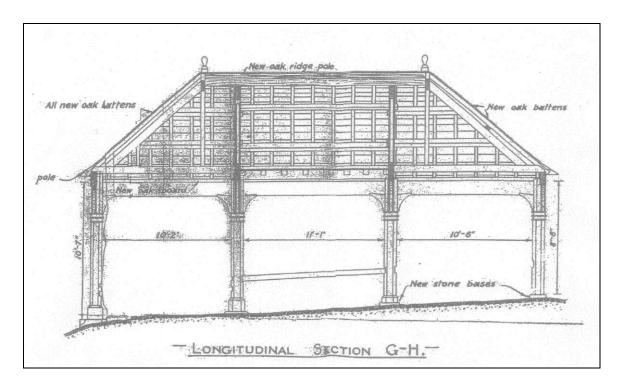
West facing section of the market hall (detail of 1927 survey drawing by G.H. Jack, County Surveyor).
